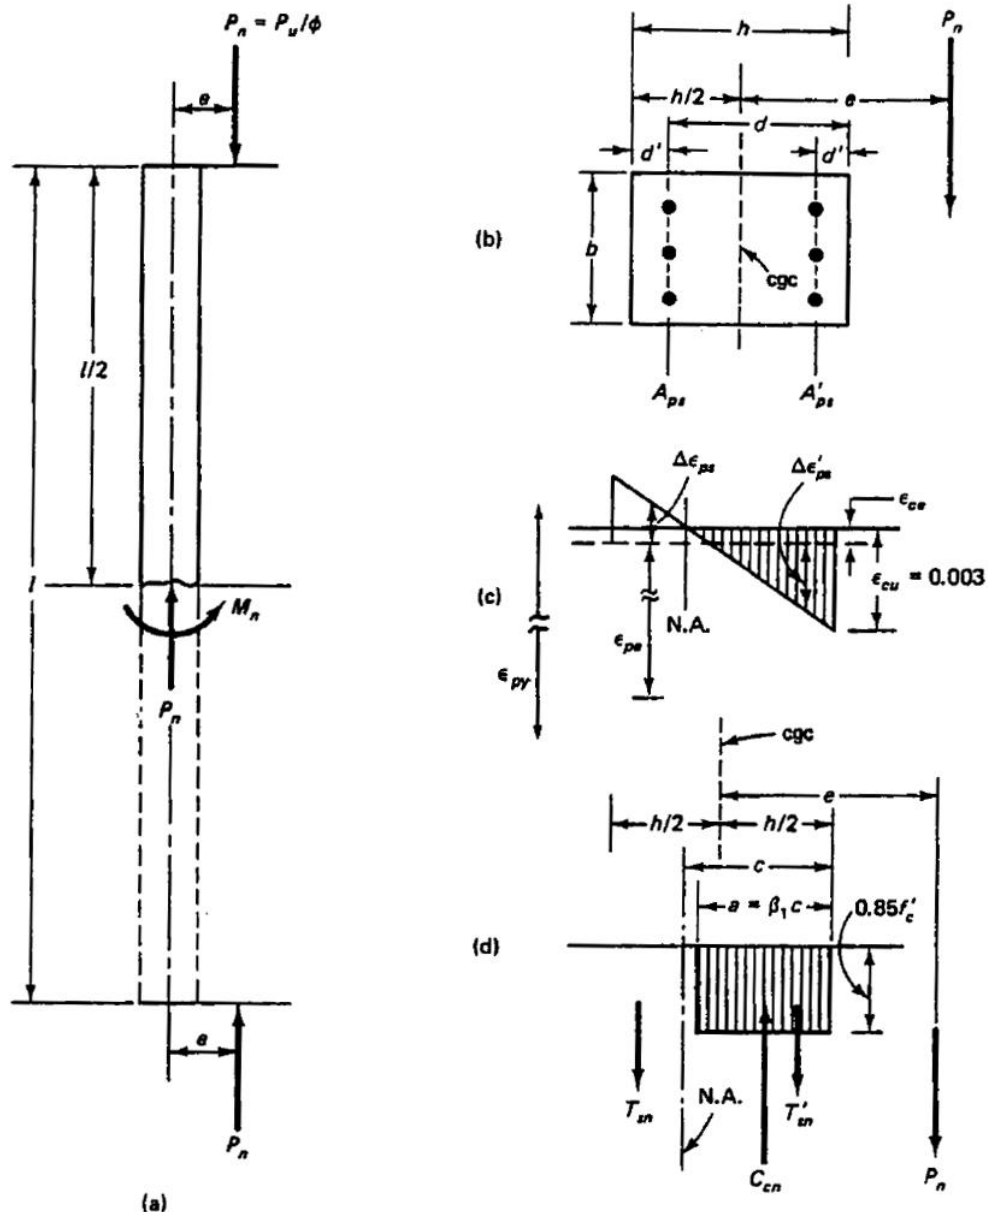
Stresses and forces in typical eccentrically loaded nonslender column. (a) Elevation. (b) Cross section. (c) Strain distribution. (d) Stresses and forces.
